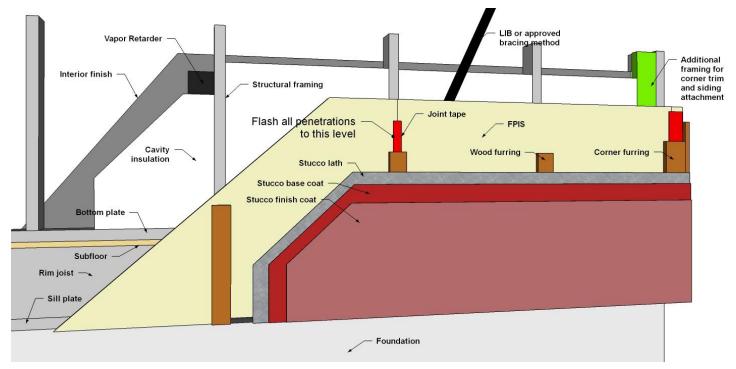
Wood-Frame Wall with LIB Bracing, FPIS as WRB, Furring (or Drainage Mat), Lath, and Stucco Veneerxix
